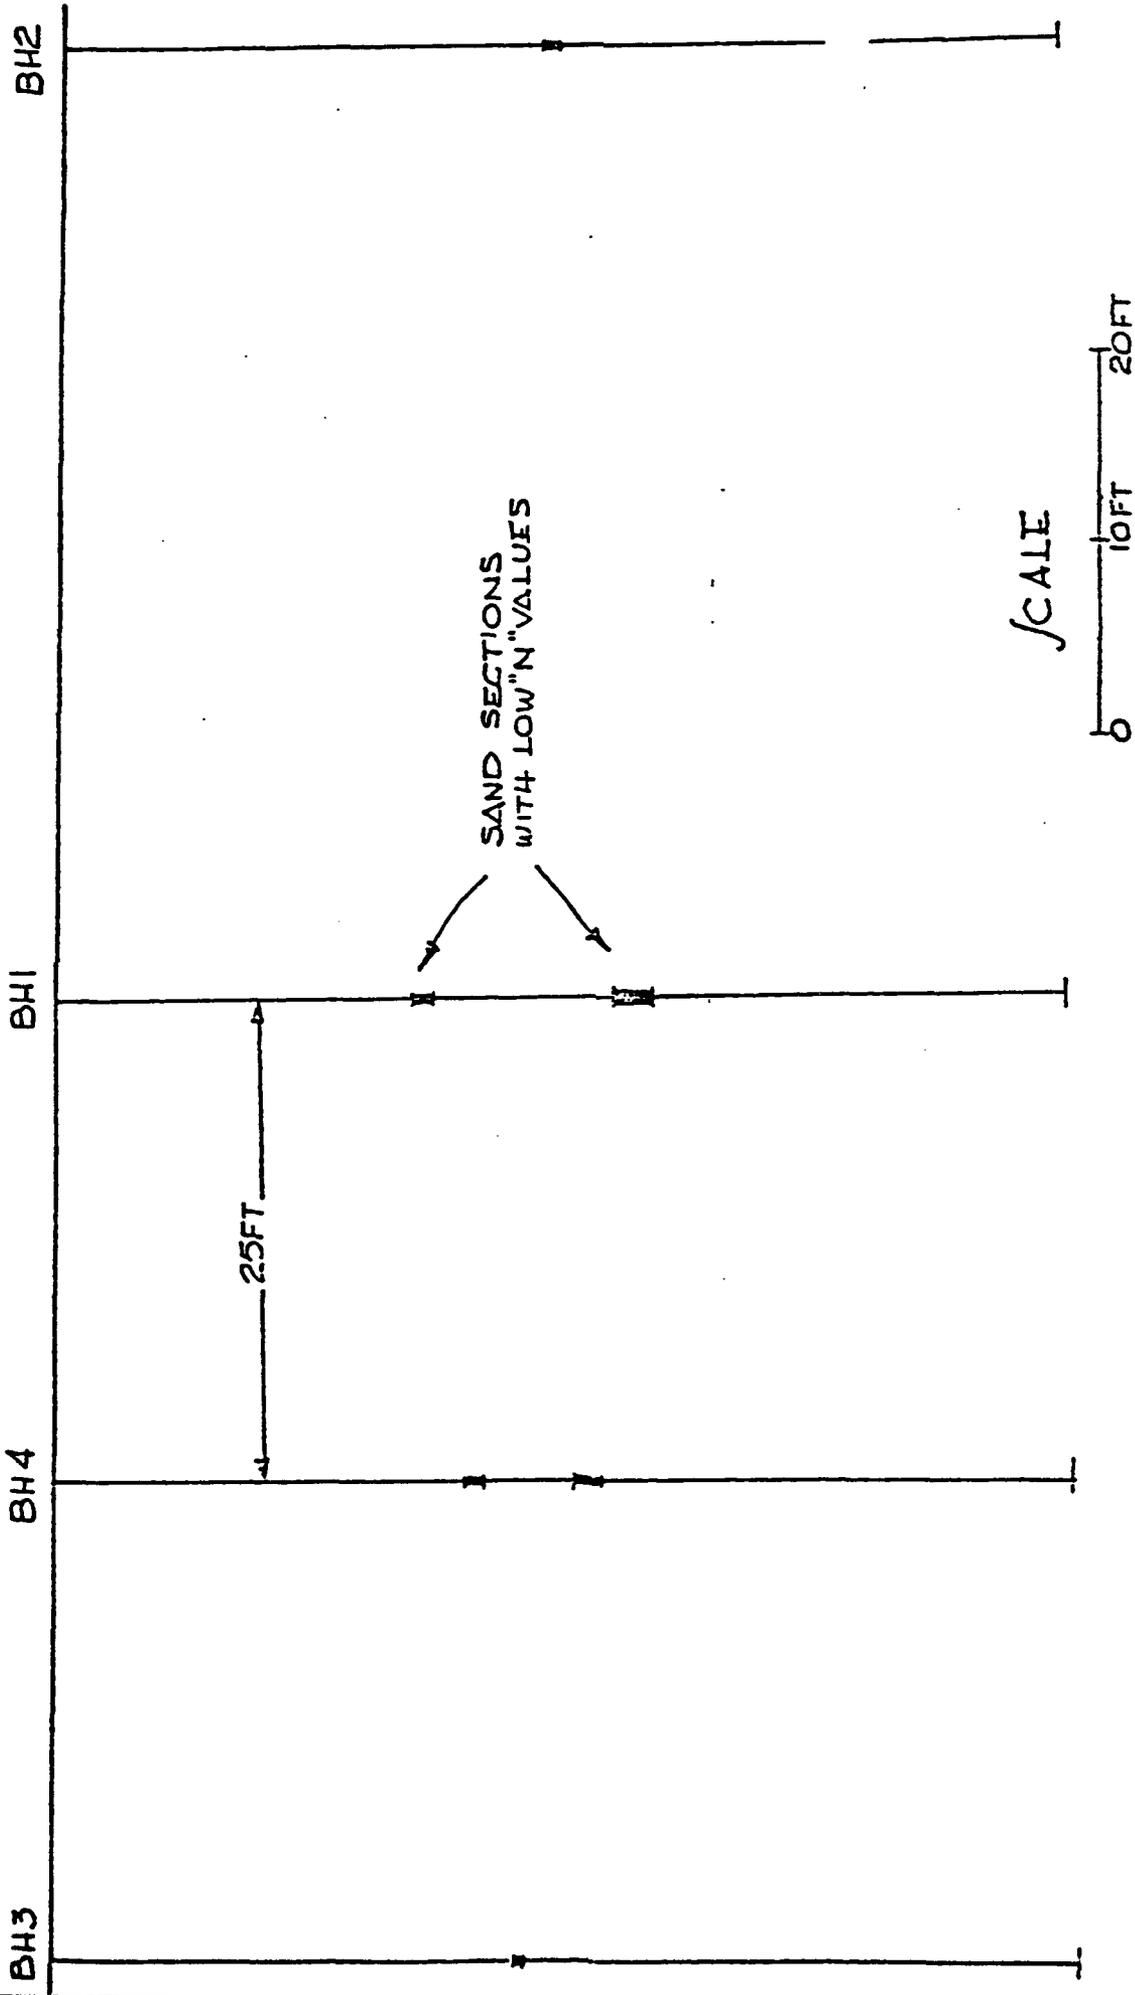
Hypothetical cross-section showing borcholes advanced around BH1 to establish extent of loose sand layers in a section approximately 10 ft thick (remaining sections not shown)
